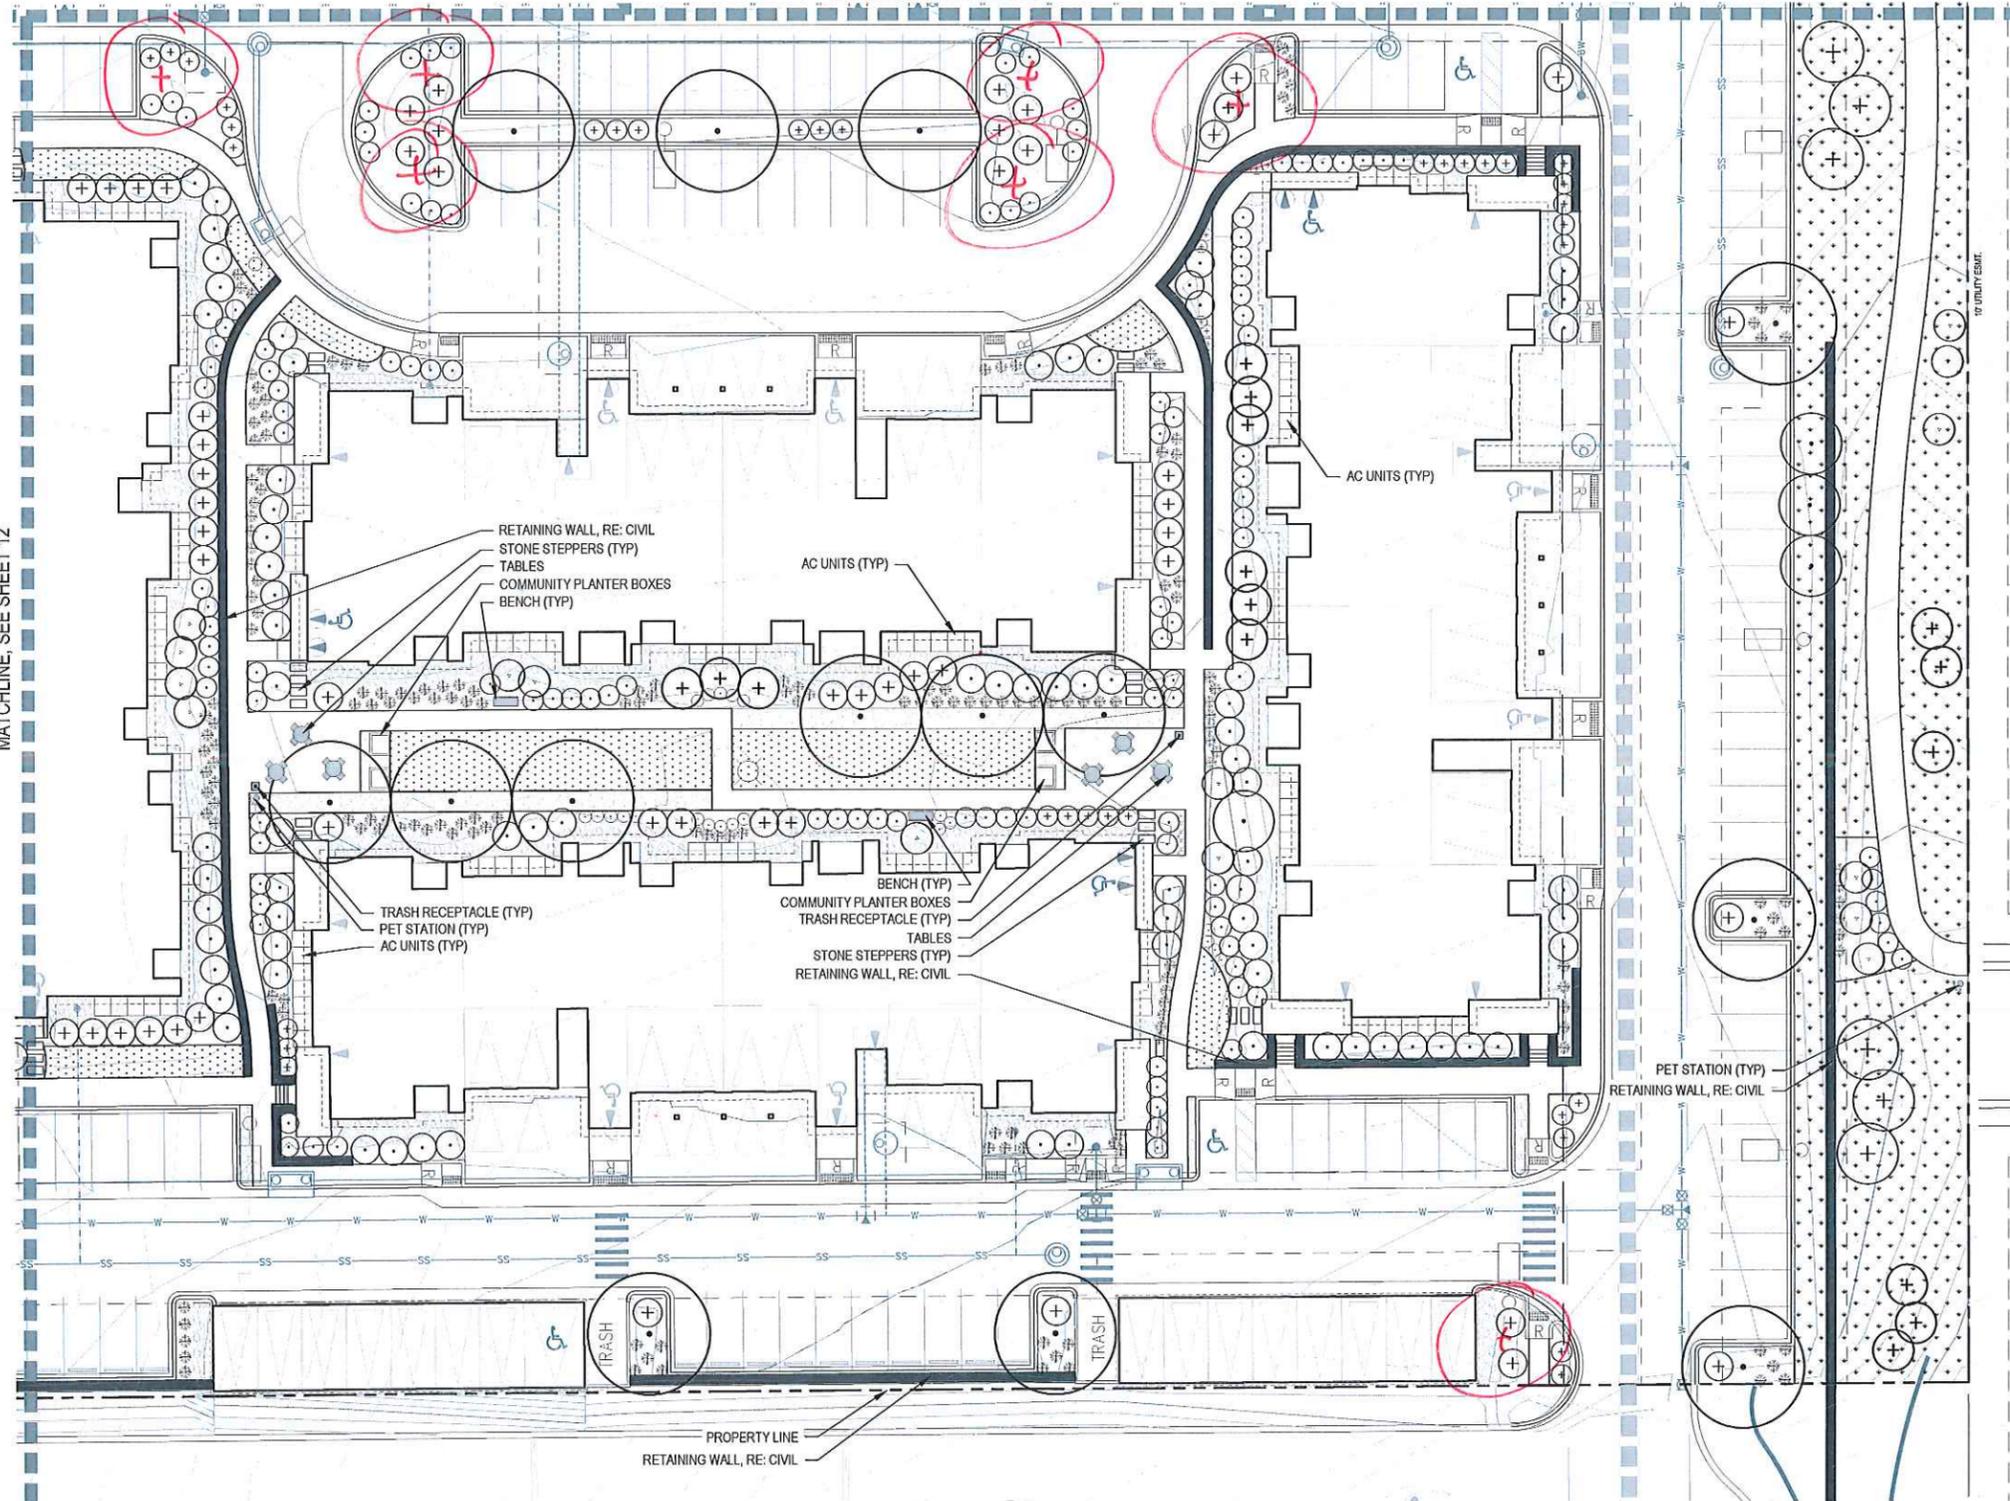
Figure P: REVISION NINE MILE SUBDIVISION FILING NO.1 BLOCK 2 PLAN AND REFERRAL SUBMITTALS LAYOUT PLAN L13 PLAN
